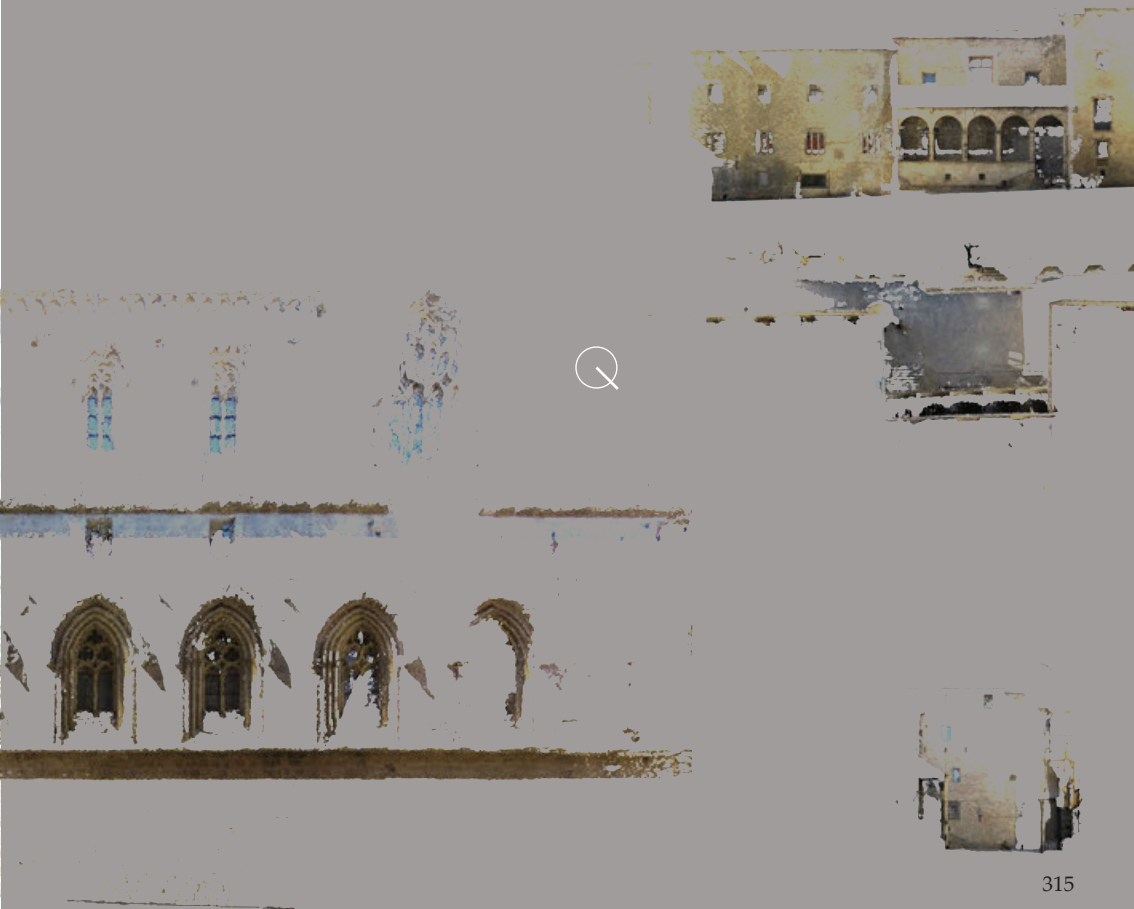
Sections and plan from a photogrammetric model of Plaça del Rei.
